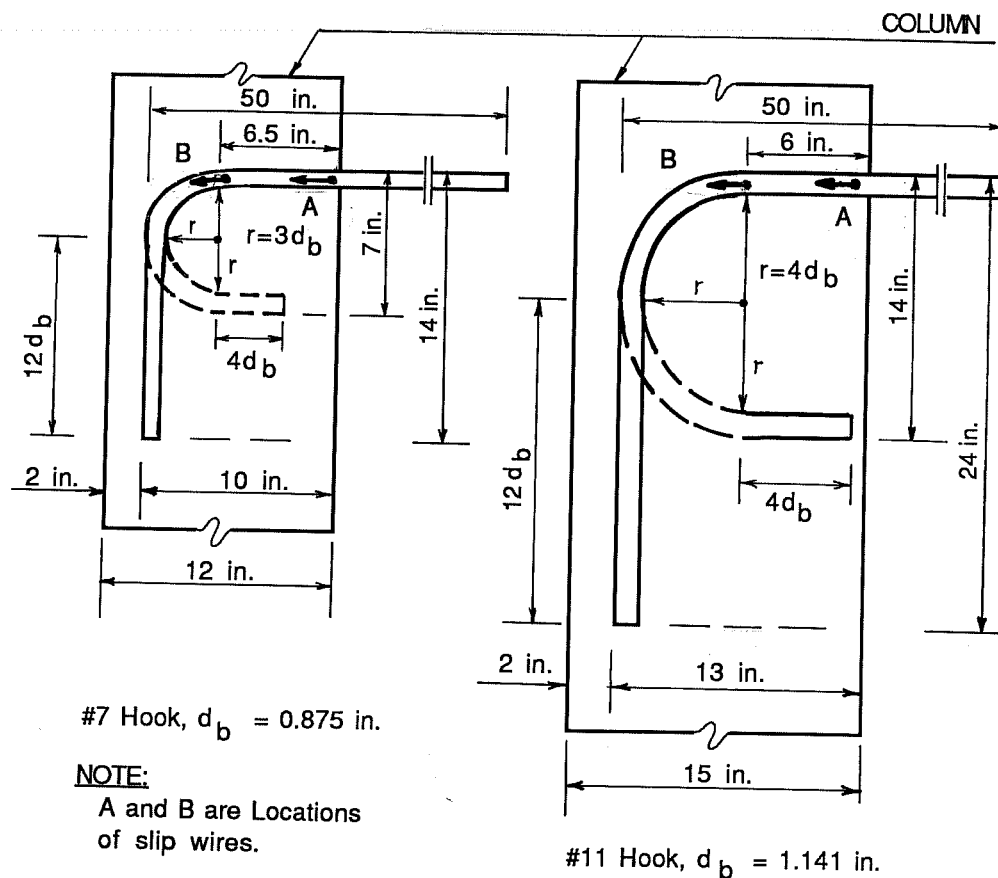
Details of anchored beam reinforcement in the hooked bar specimens.
